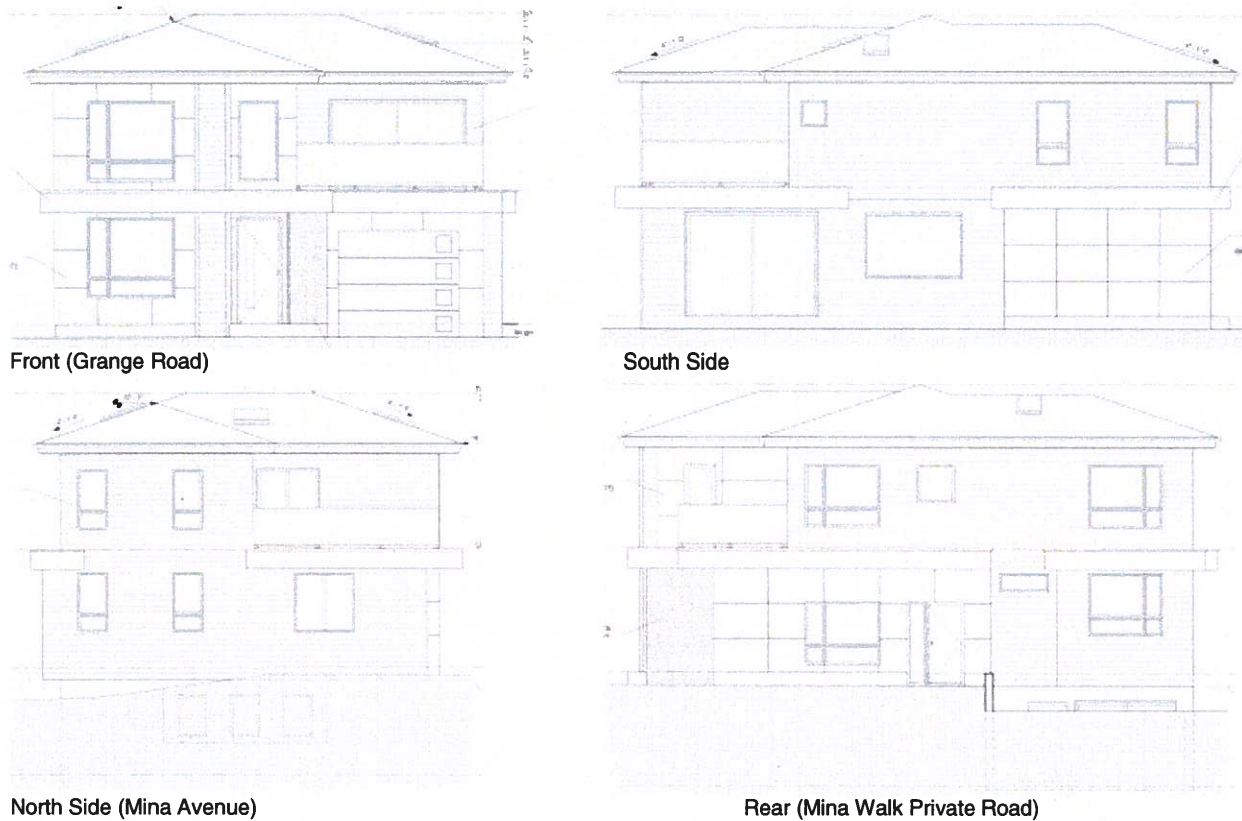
Proposed Elevations (from plans by Aspire Custom Designs)
